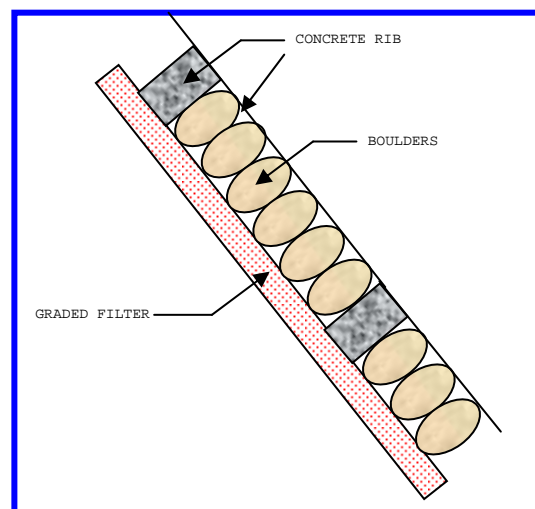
TYPICAL TRADITIONAL BOULDER LINING IN CONCRETE RIBS
